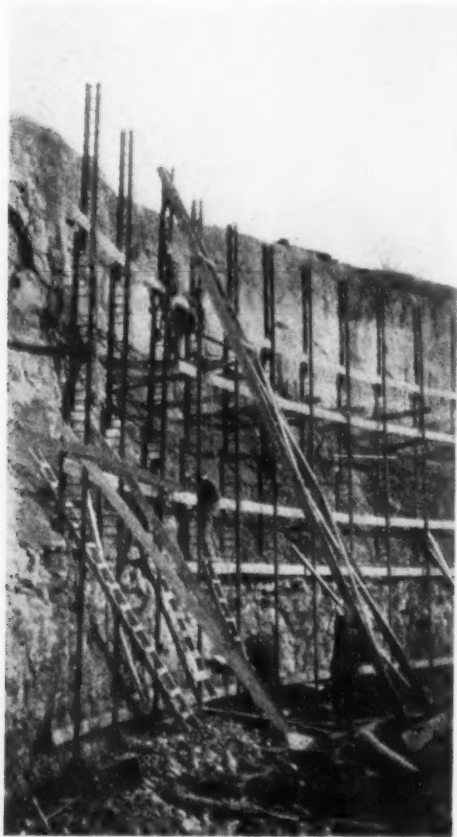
PLACING SUPPORTS FOR REINFORCING STEEL
